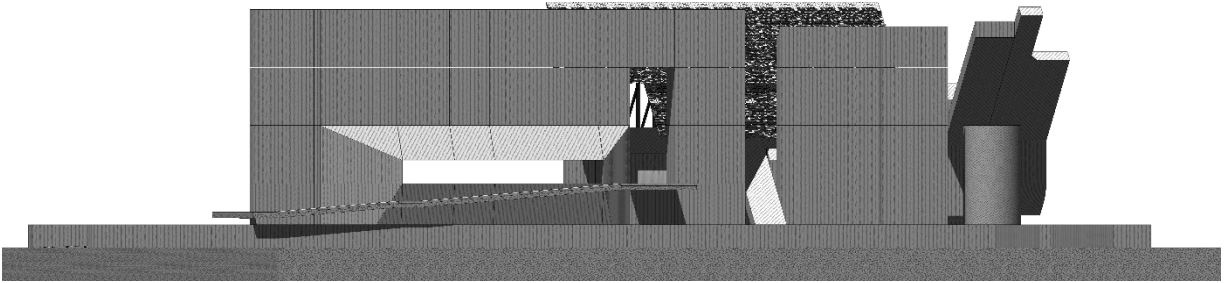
Hideaway Park Folly, True South Elevation, by Author
